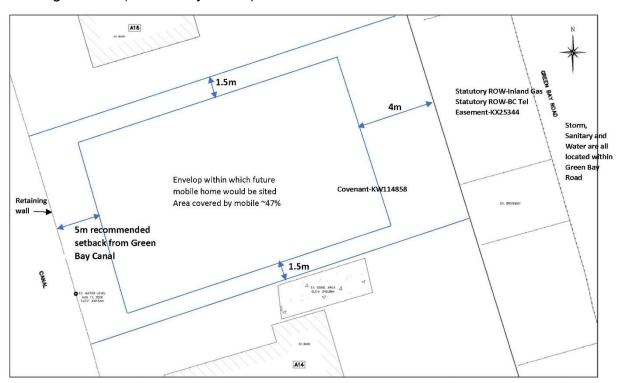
Site Plan for Pad #15A from Flood Hazard Assessment
